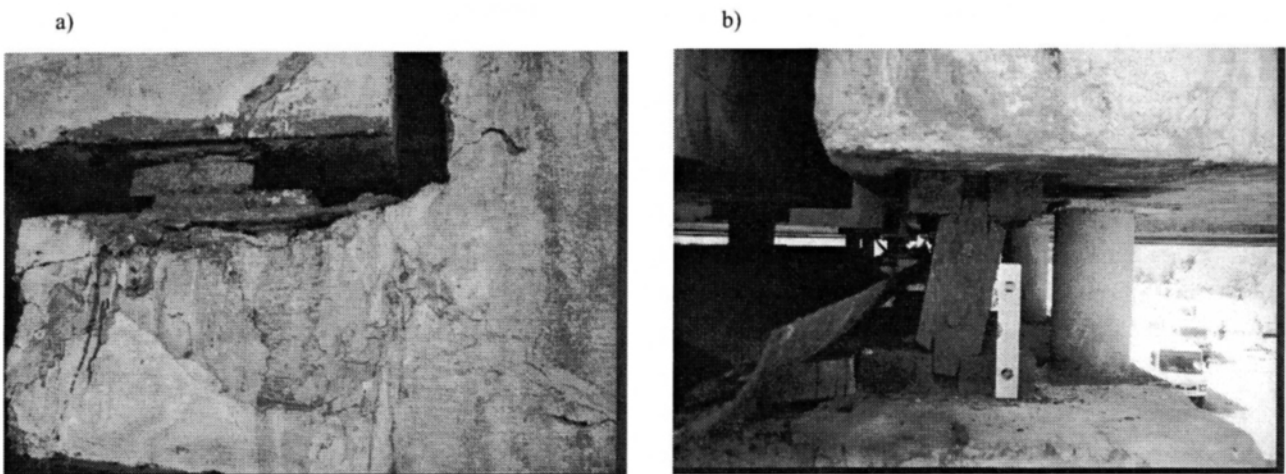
Deterioration of bridge girder corbel due to faulty positioning and rusting of steel sliding bearing (a) and excessive tilting of rocker bearing (b)
